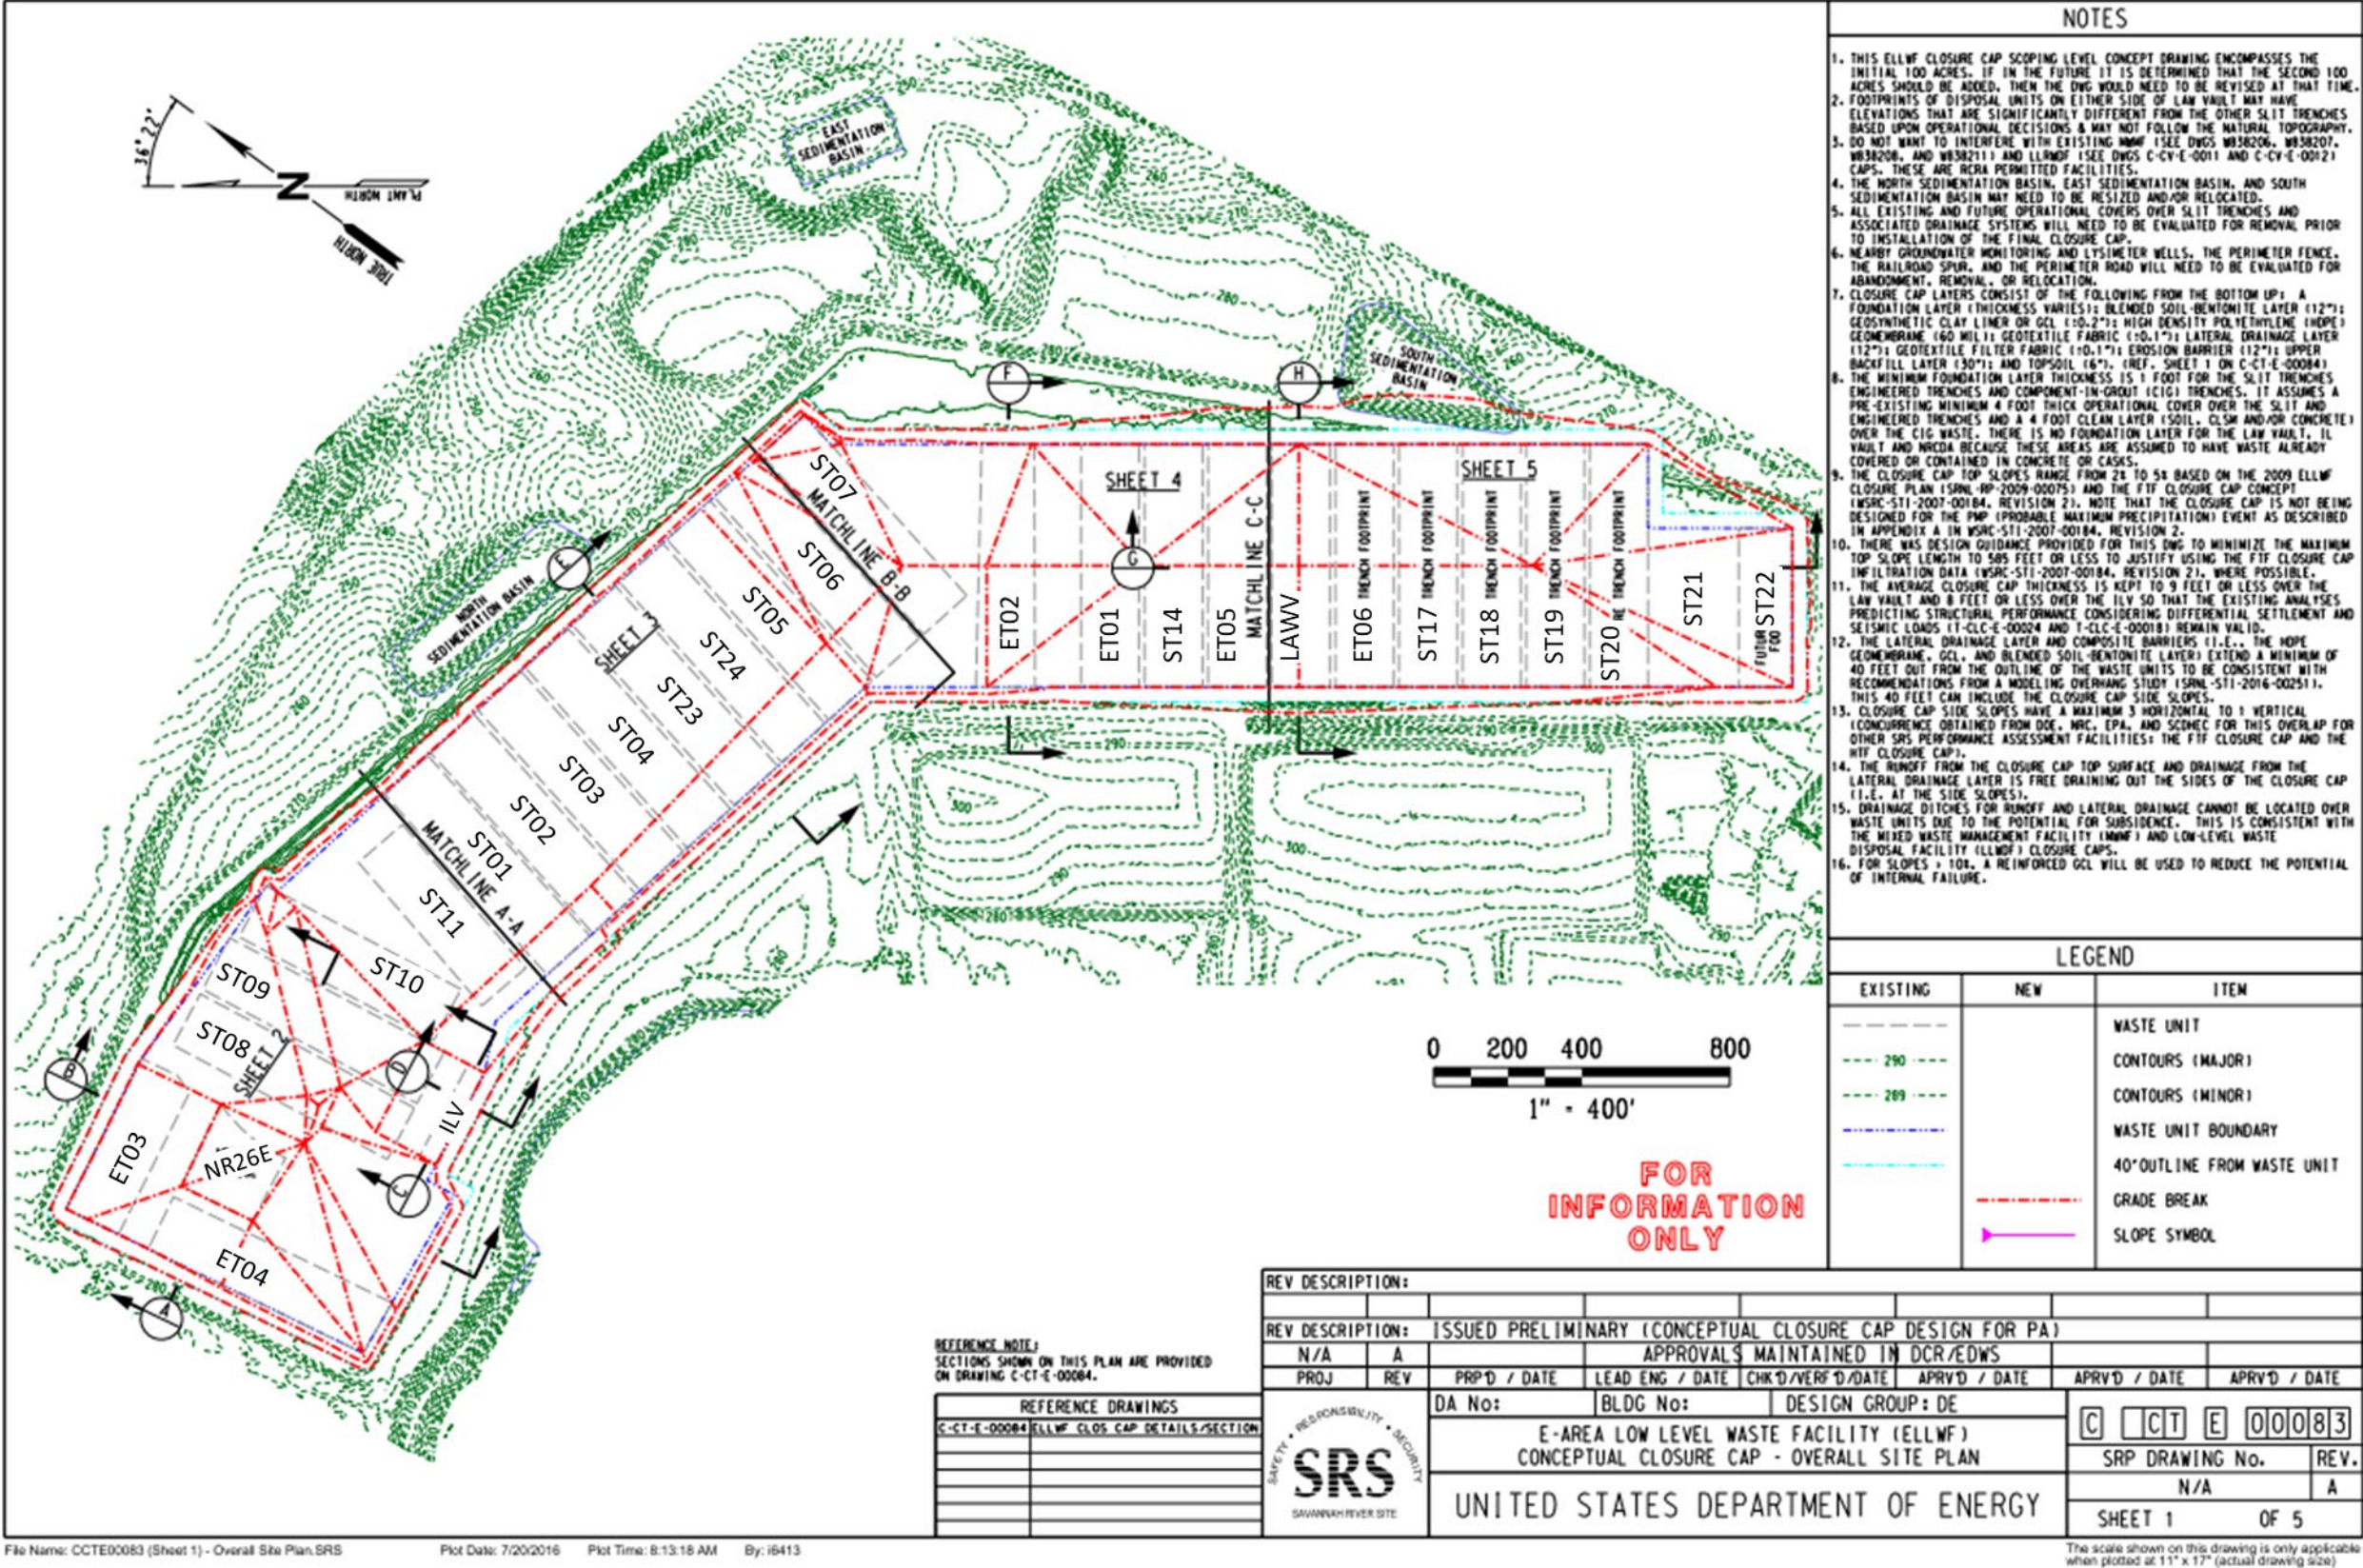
Conceptual Closure Cap Design Plan View (Sheet 1 of 5) – Overall Site Plan for Current Open Area (C-CT-E-00083, 2016)
